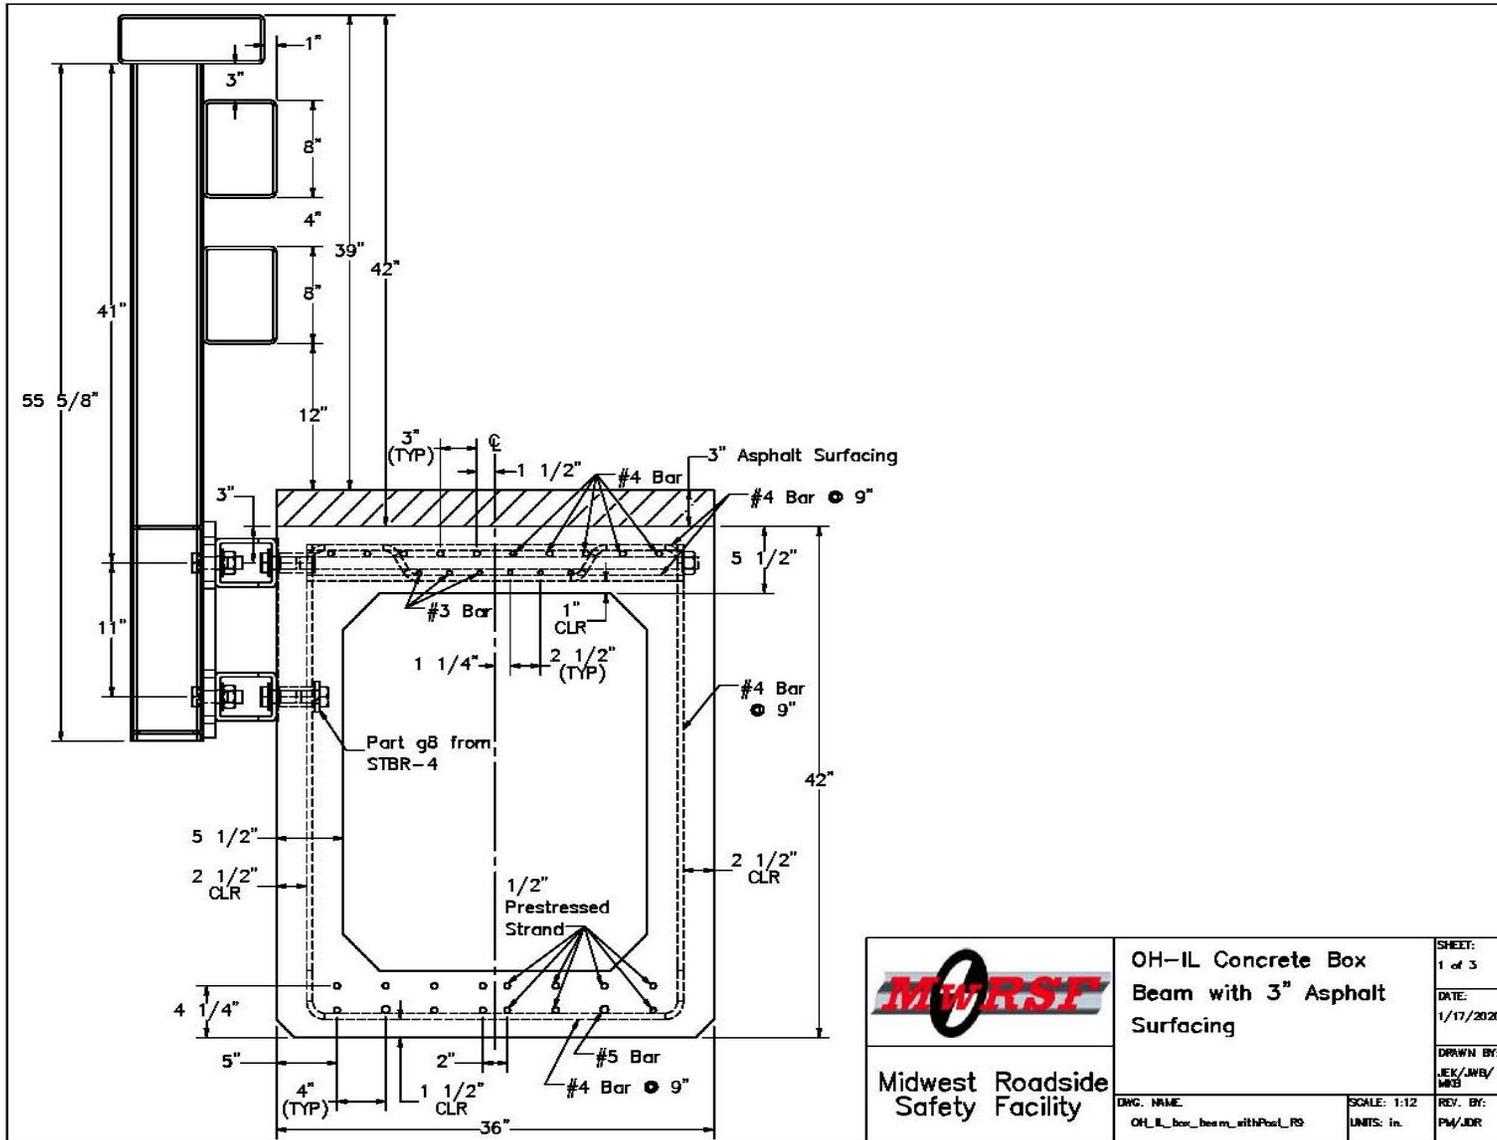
Typical 42-in. (1067-mm) Deep Concrete Box-Beam Girder with Asphalt Wearing Surface
